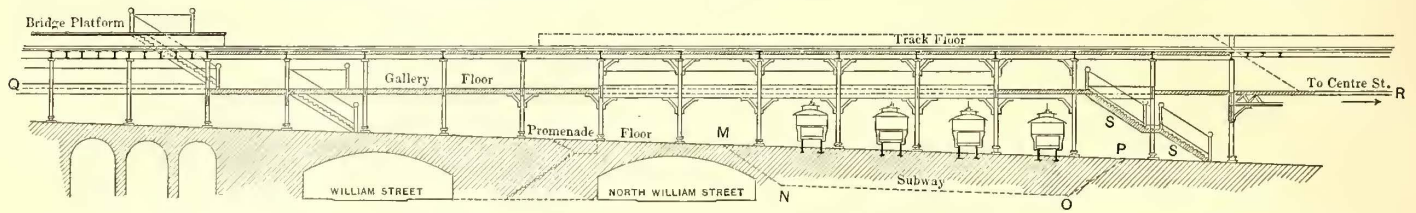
LONGITUDINAL SECTION OF NEW YORK TERMINAL
